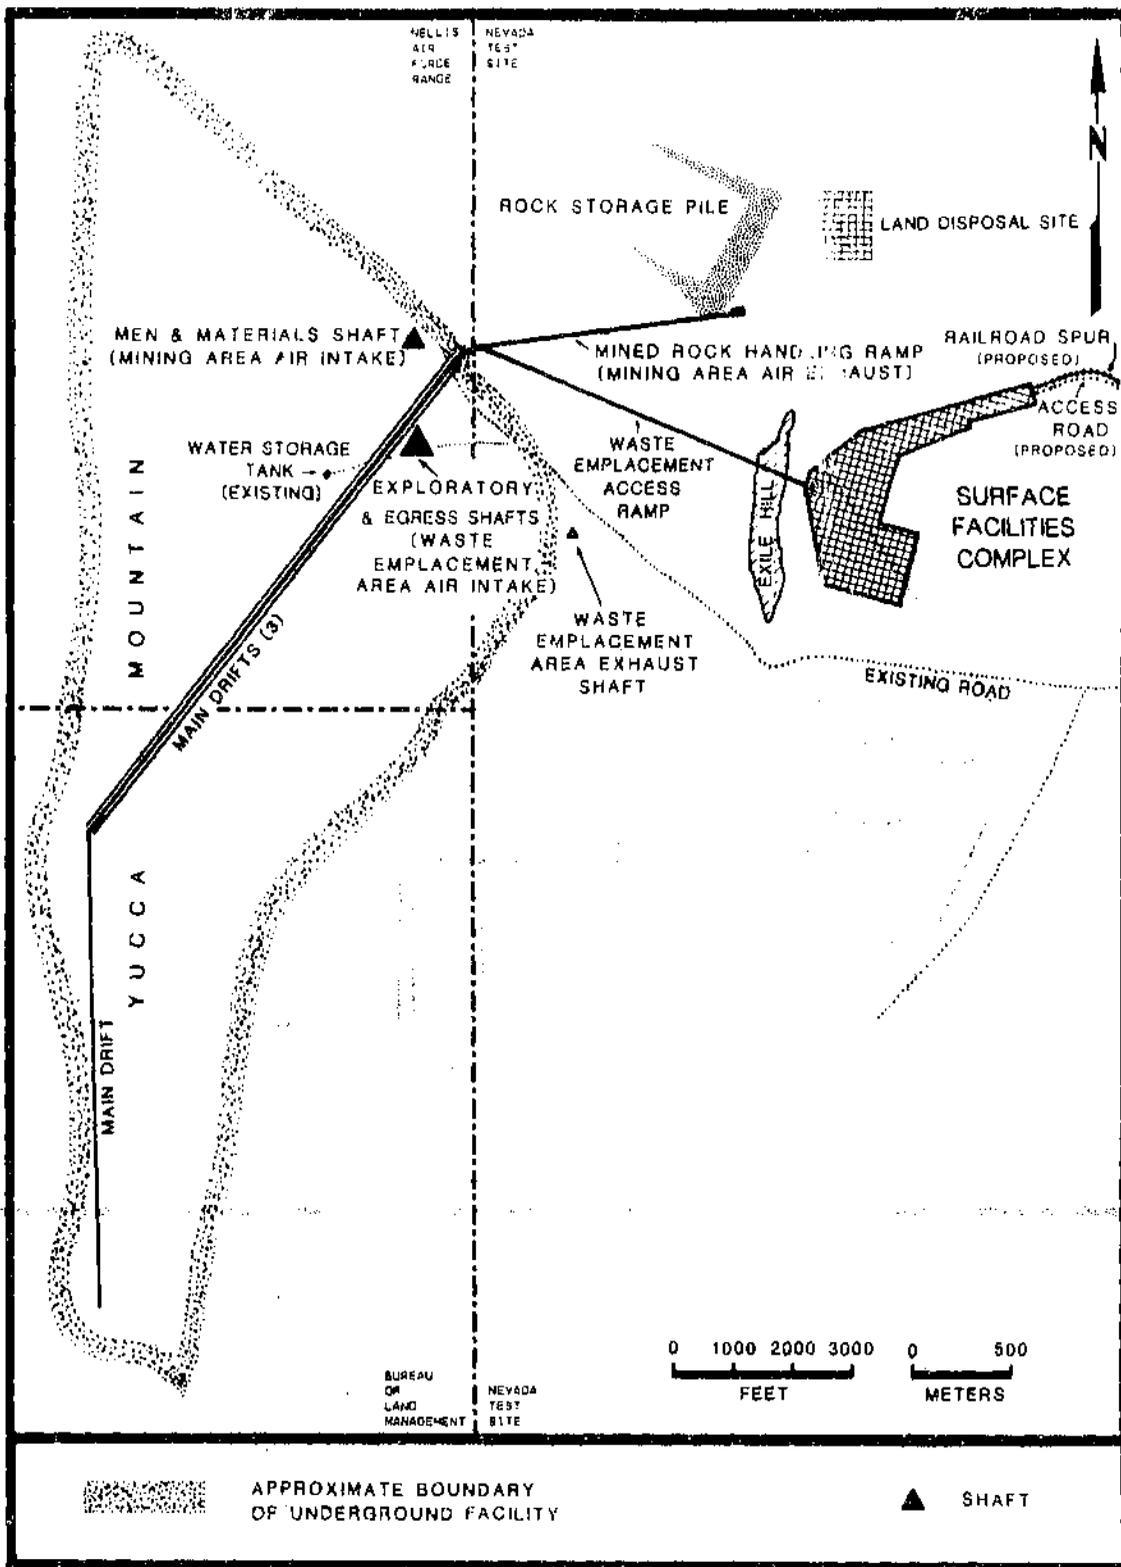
Two-stage repository site plan. Modified from MacDougall, 1985.
